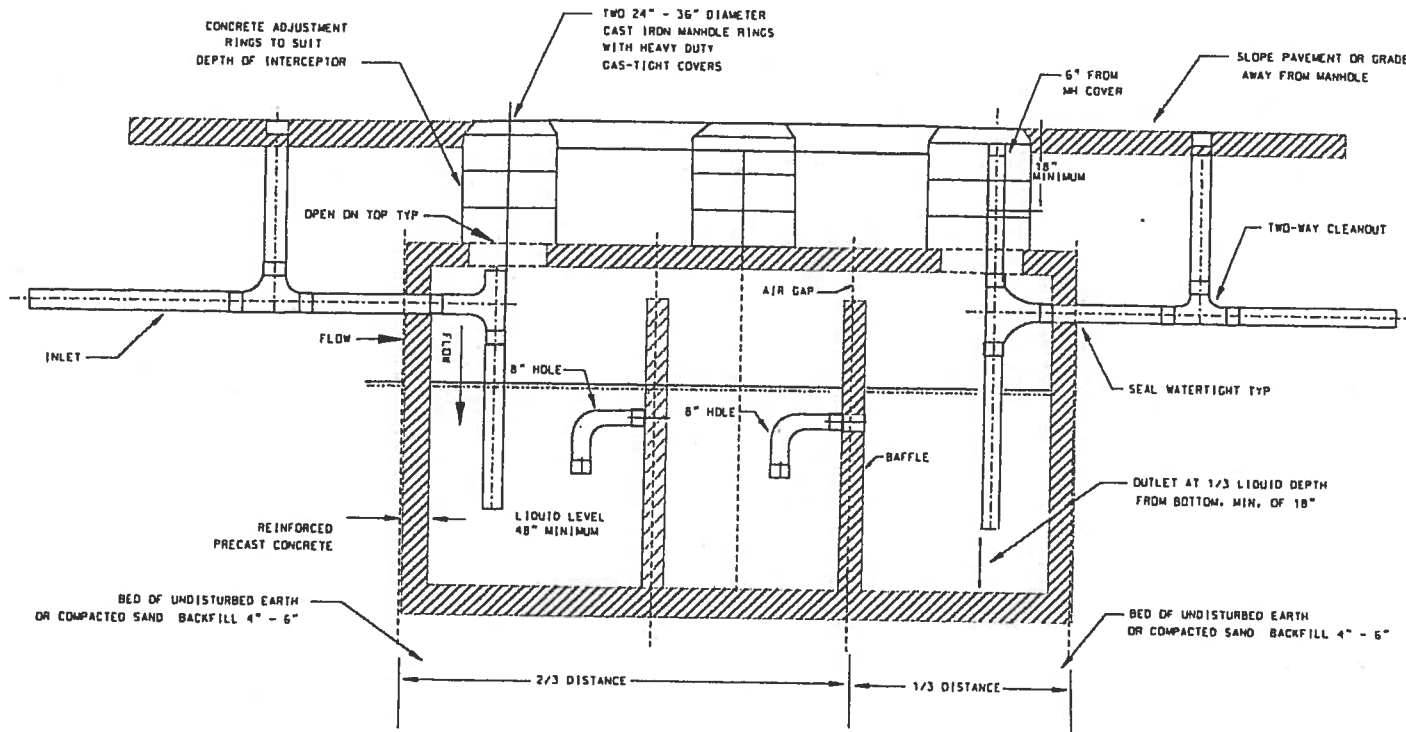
DETAIL SHOWS GENERAL SCHEMATIC REQUIREMENTS.
